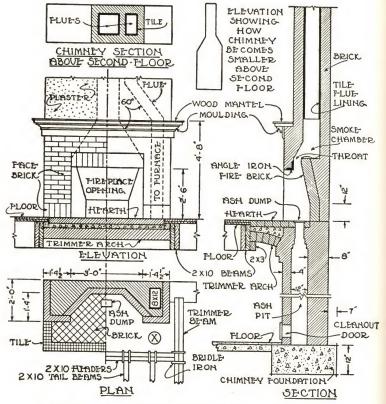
Fireplace and Chimney Symbols in Plan and Elevation Views
